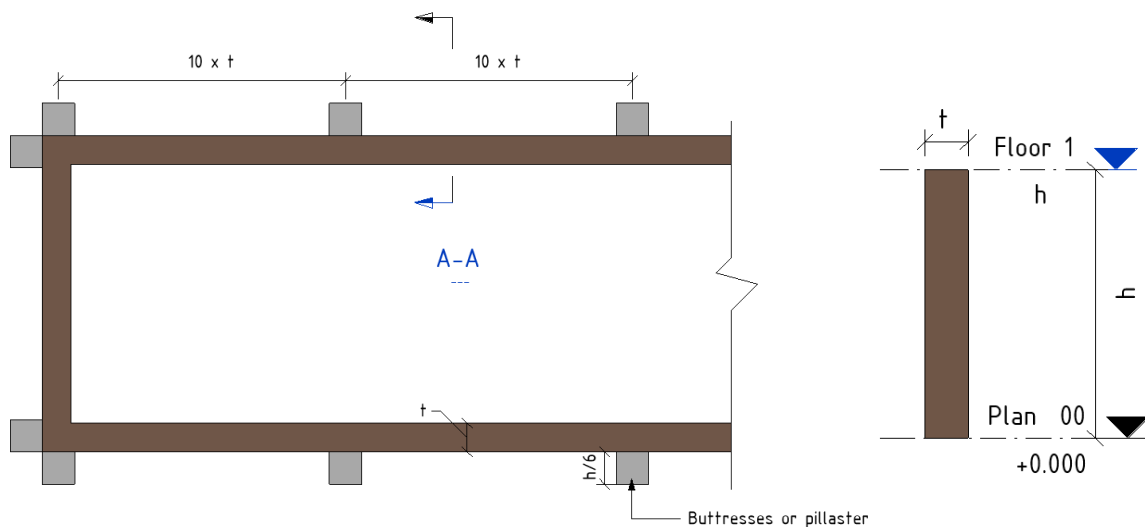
Pilaster or buttresses should be provided when the span extend 10 times the thickness of the wall. The height of the wall should be between 1,8 m and 2,5m m. The thickness of the wall should be minimum 400-450 mm. Figure based on ref [33].
